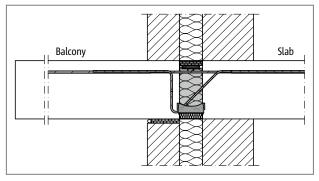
Schöck Isokorb® T type K: Cavity wall with a balcony at inner slab level
